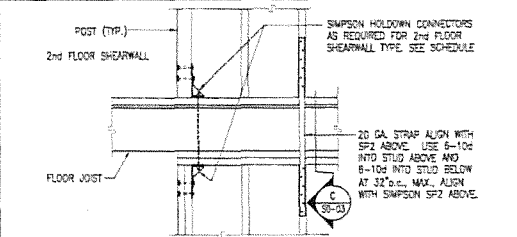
DETAIL OF PLATE NAILING REQUIREMENT AT 2nd FLOOR OF TWO STORY INTERIOR SHEARWALL
